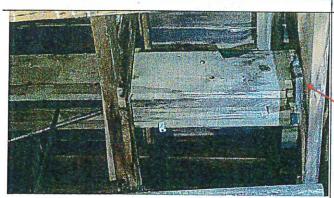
| Grid B Inverted King Post Truss. Shows rod termination at top chord and steel hanger to northsouth IVKPT top chord.
